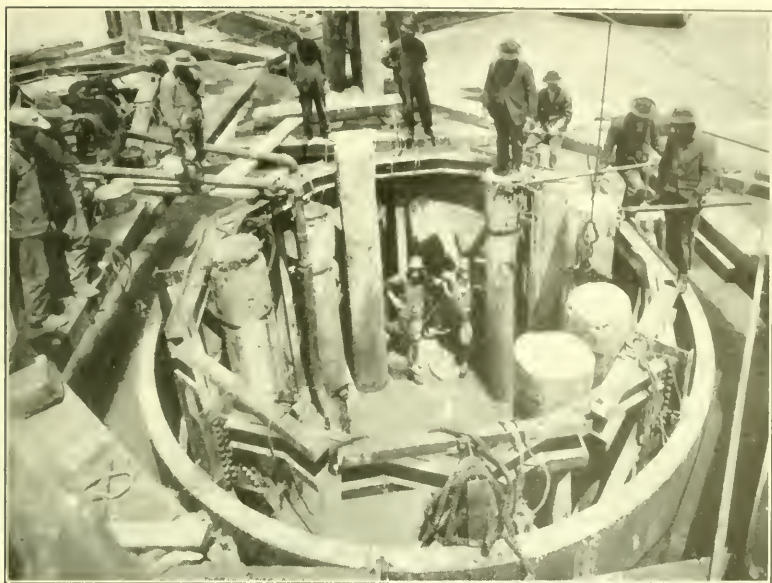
CUTTING OFF PILES IN PIER 2, ABUTMENT 4, DUMBARTON POINT.
